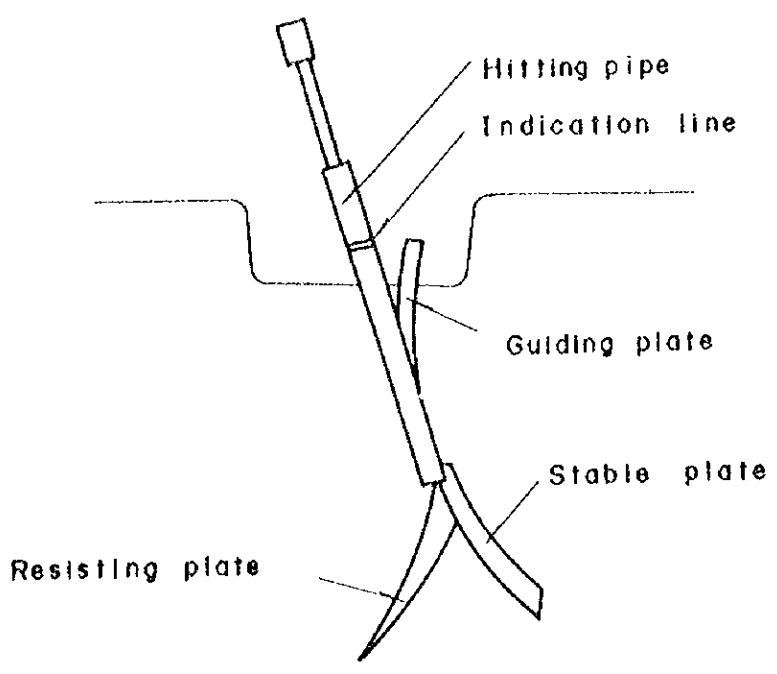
Installation of Stay Anchor (3/4)
